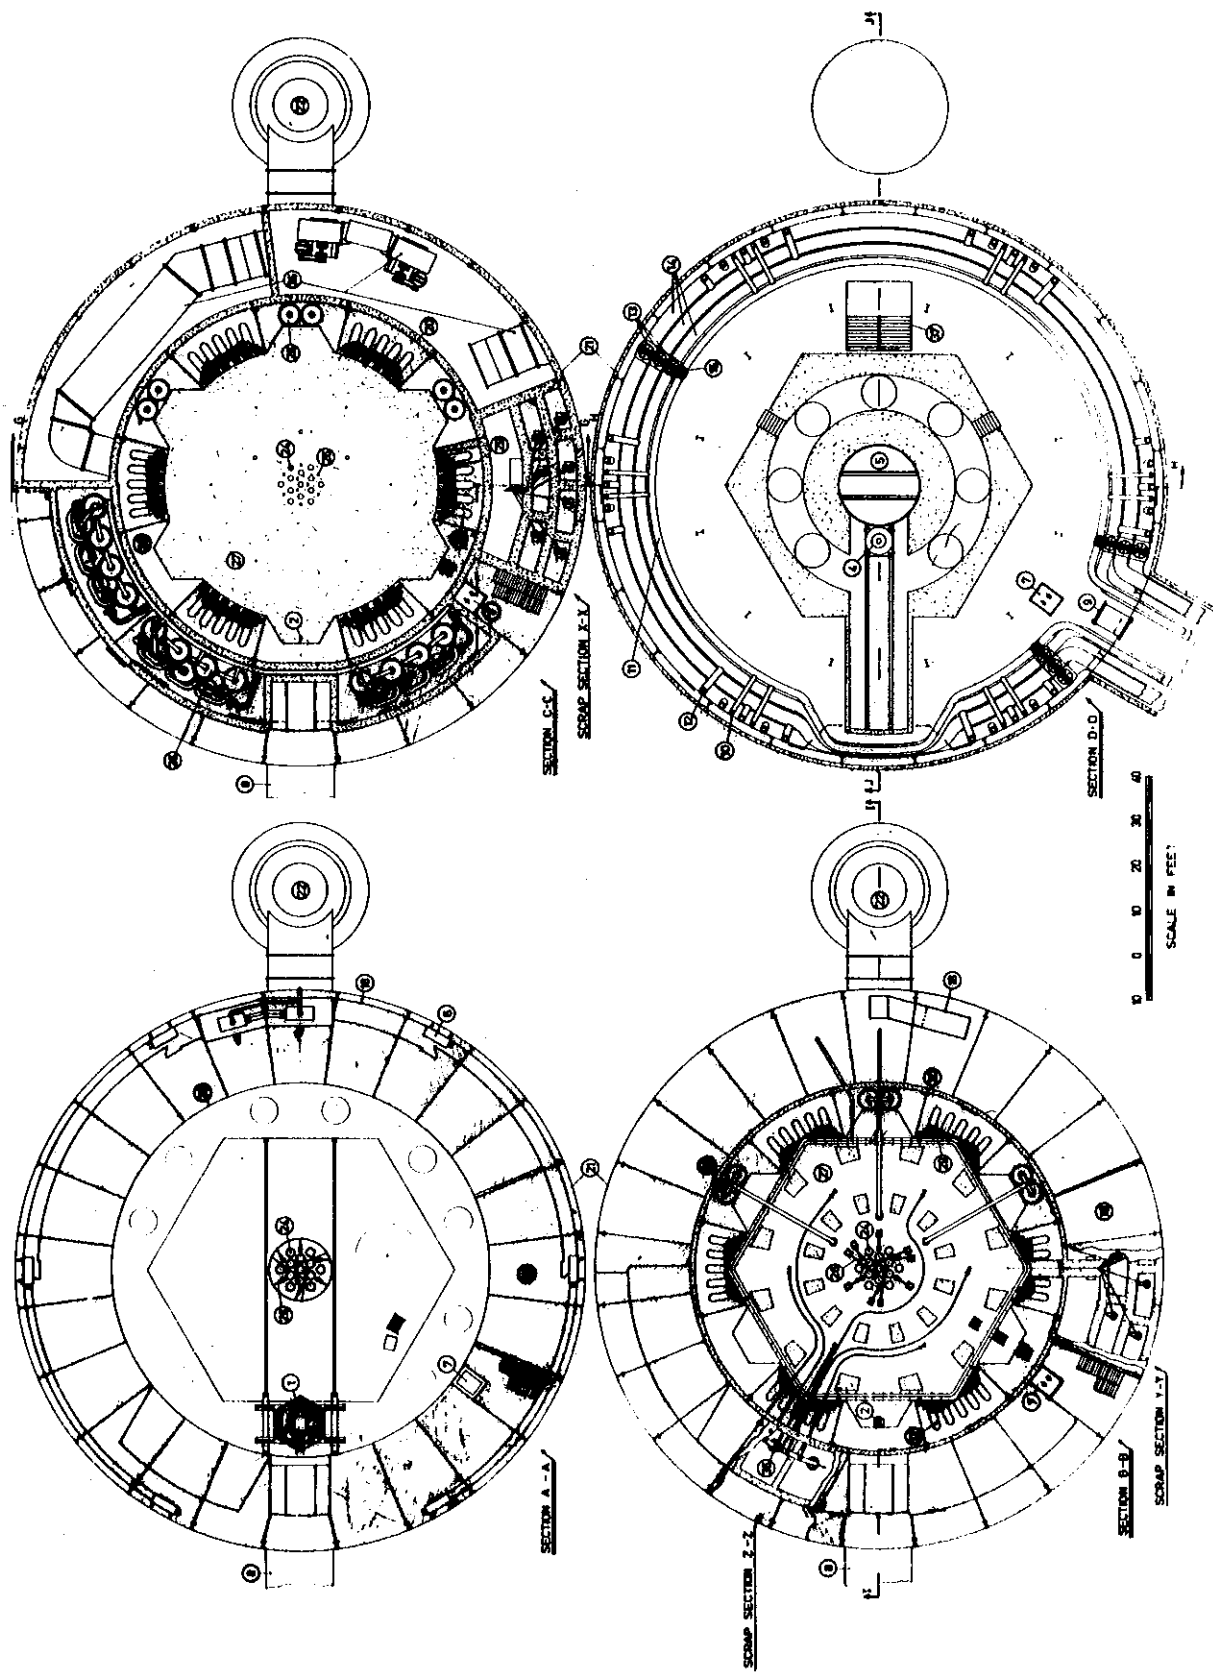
(b) GENERAL ARRANGEMENT OF REACTOR PLANT — PLAN SECTIONS A, B, C, D
